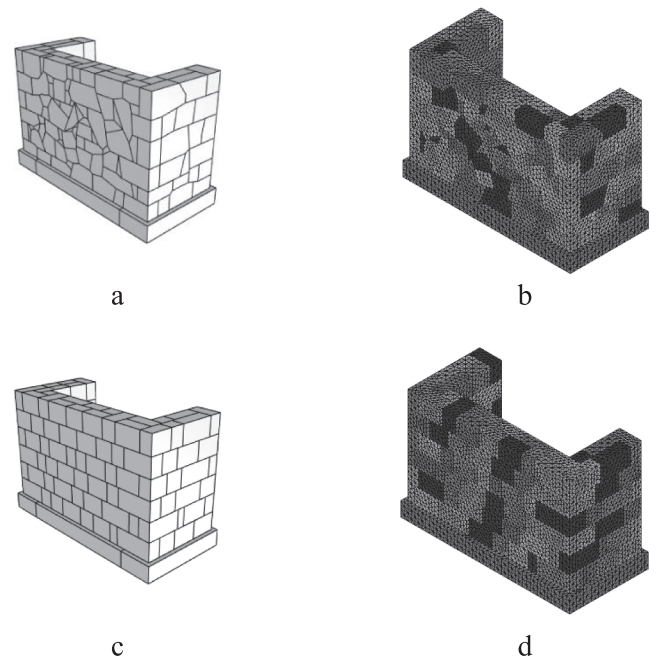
Geometrical 3D model for simplified finite element based micro-modelling drystone masonry wall (a); Drystone masonry wall (DS) final finite element micro model (b); Geometrical 3D model for simplified finite element based micro-modelling regular stone masonry wall (c); Regular stone masonry wall (REGW) final finite element micro model (d).
